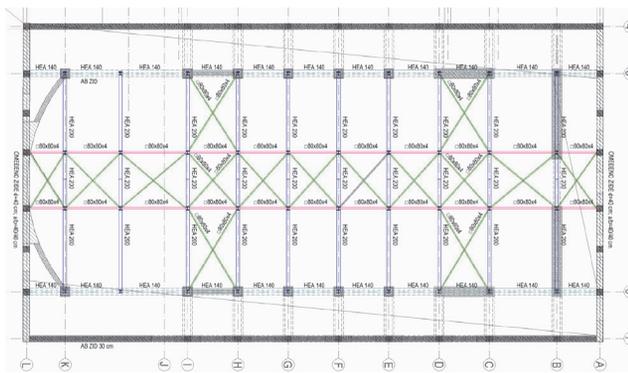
Construction of the lower belt of the new steel structure of the hall roof [11]
